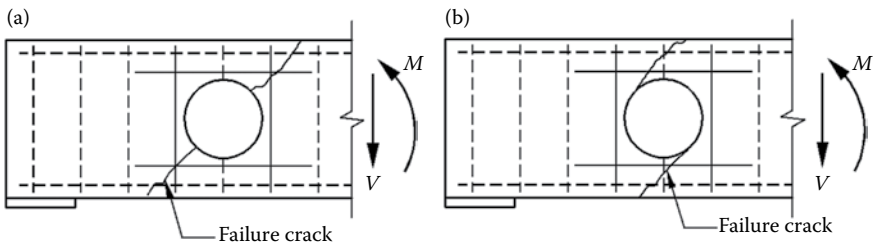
Failure modes of a beam with a small opening in a region of predominant shear: (a) beam-type shear failure and (b) frame-type shear failure.
